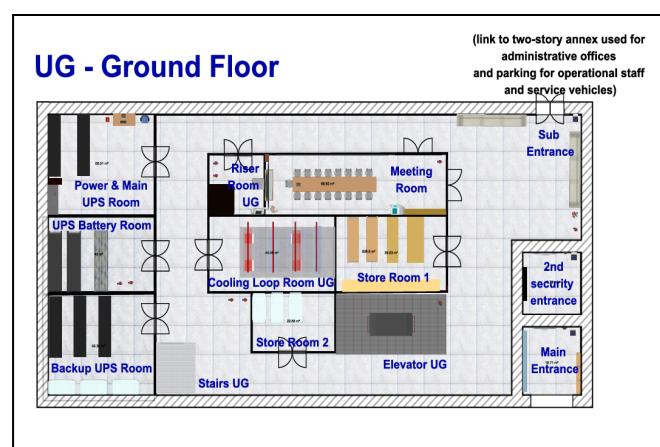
Ground Floor Floor Plan (2D View)
